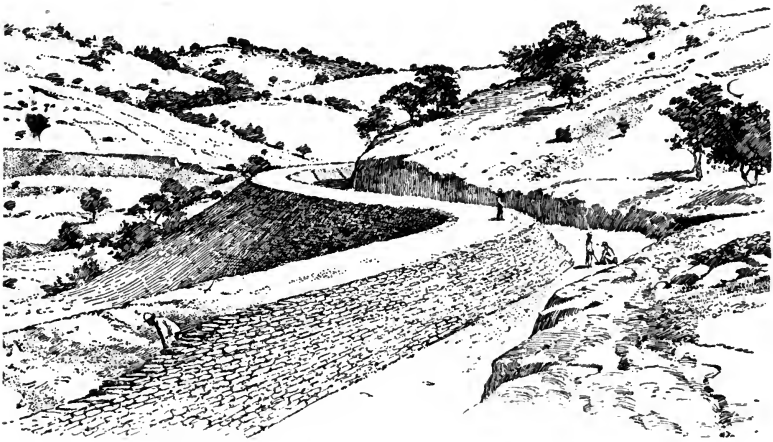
TURLOCK CANAL. VIEW OF SIDEHILL WORK.
